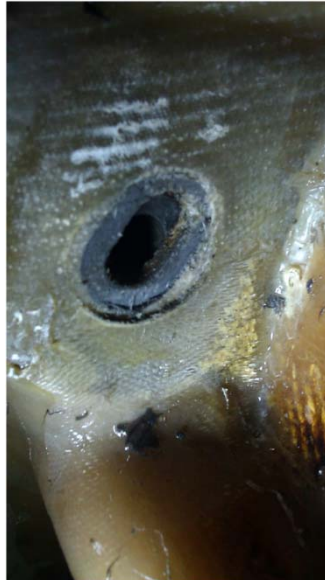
Showing inspection Side view. (See Figure 2 for Top)
